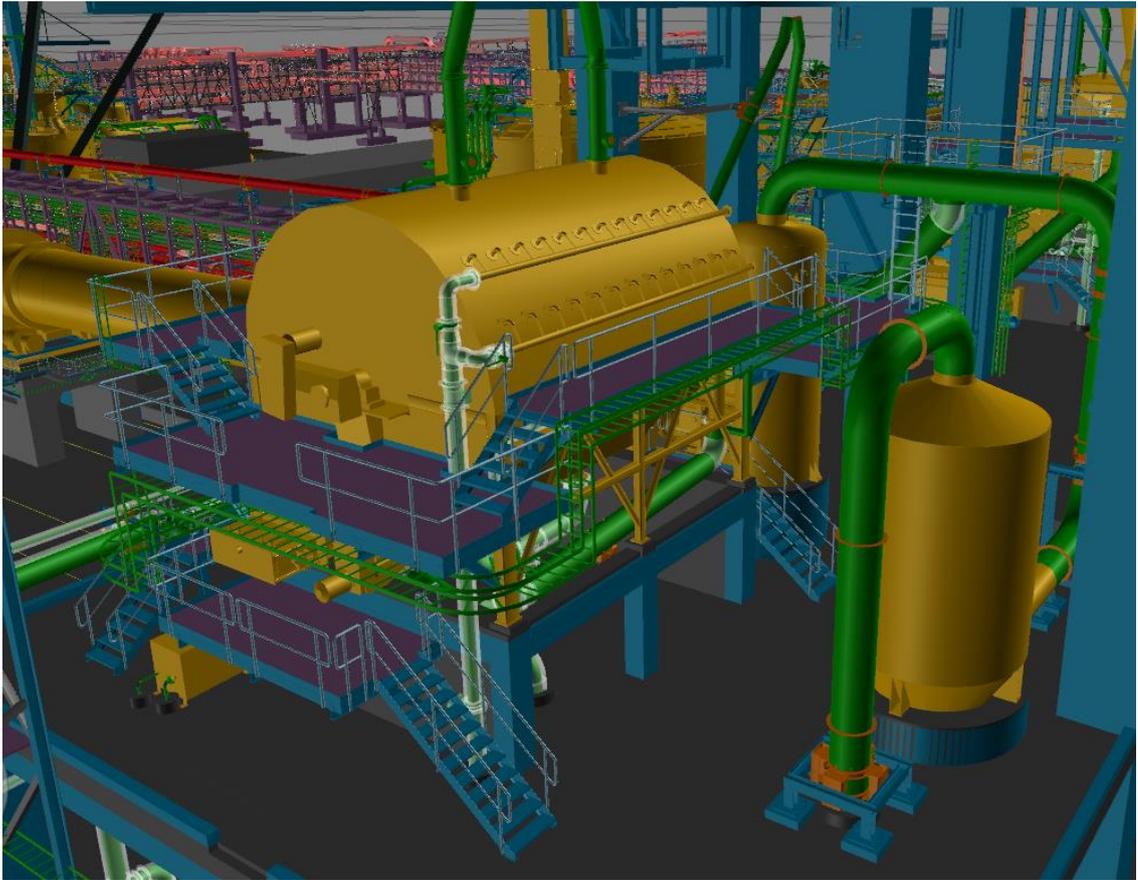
Equipment (yellow), piping (green) and service platforms (blue/violet)
